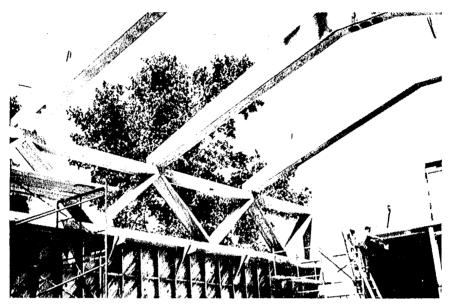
Gravity Connection: A-frames bearing on precast trusses
